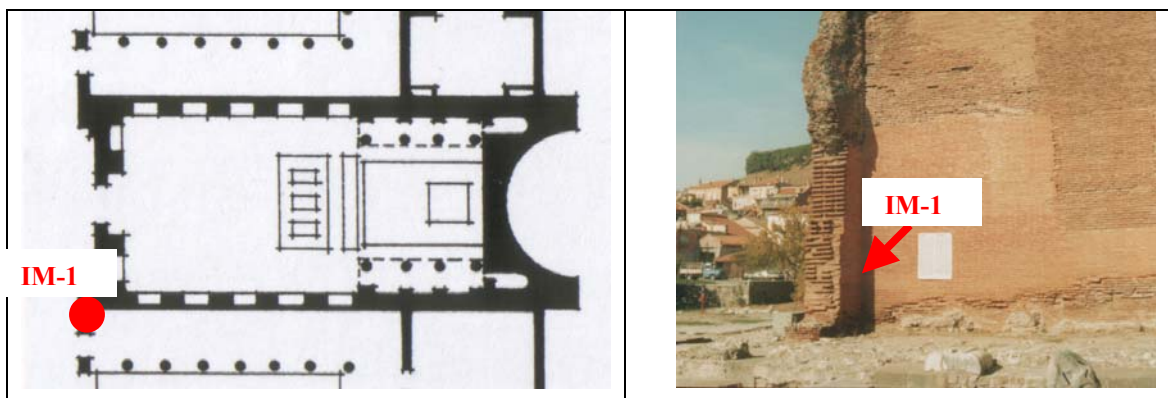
10. Plan of the Serapis Temple (Radt 2002) and view from the south-west elevations (2004) showing where intervention mortar sample (IM-1) was collected.
